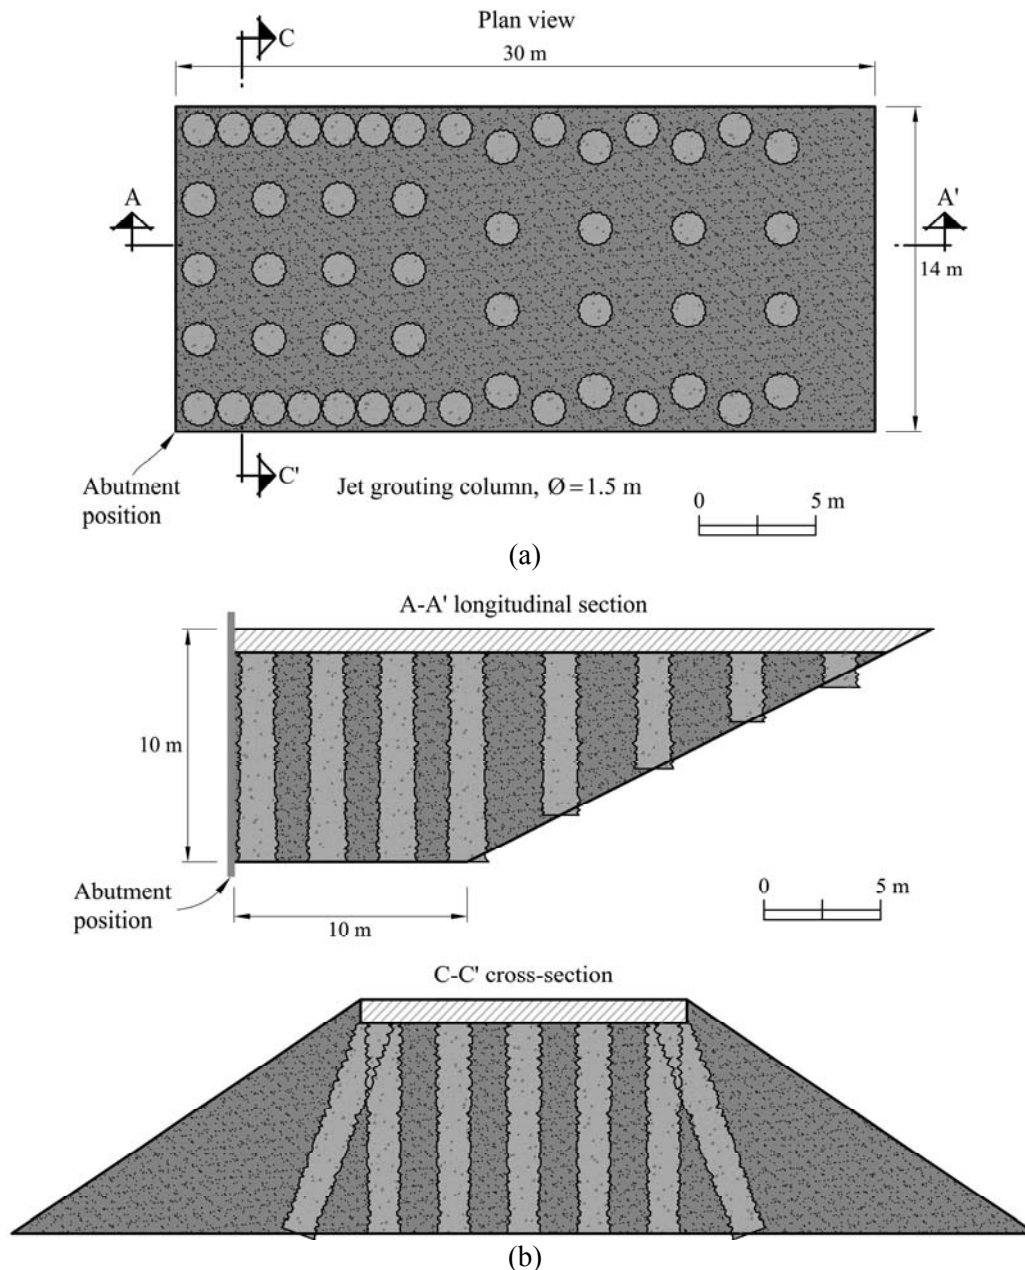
Jet-grouting treatment of embankments. (a) Position of columns in plan view; (b) longitudinal and cross-sections
